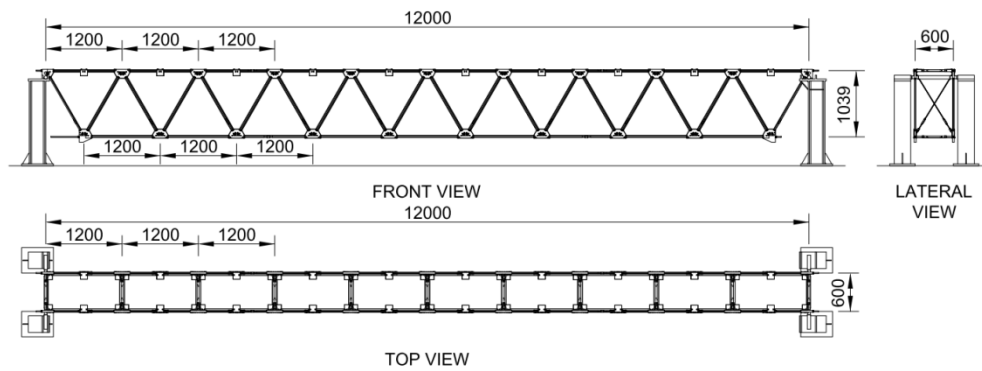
Engineering drawings of the 12 m prototype TVTy.
